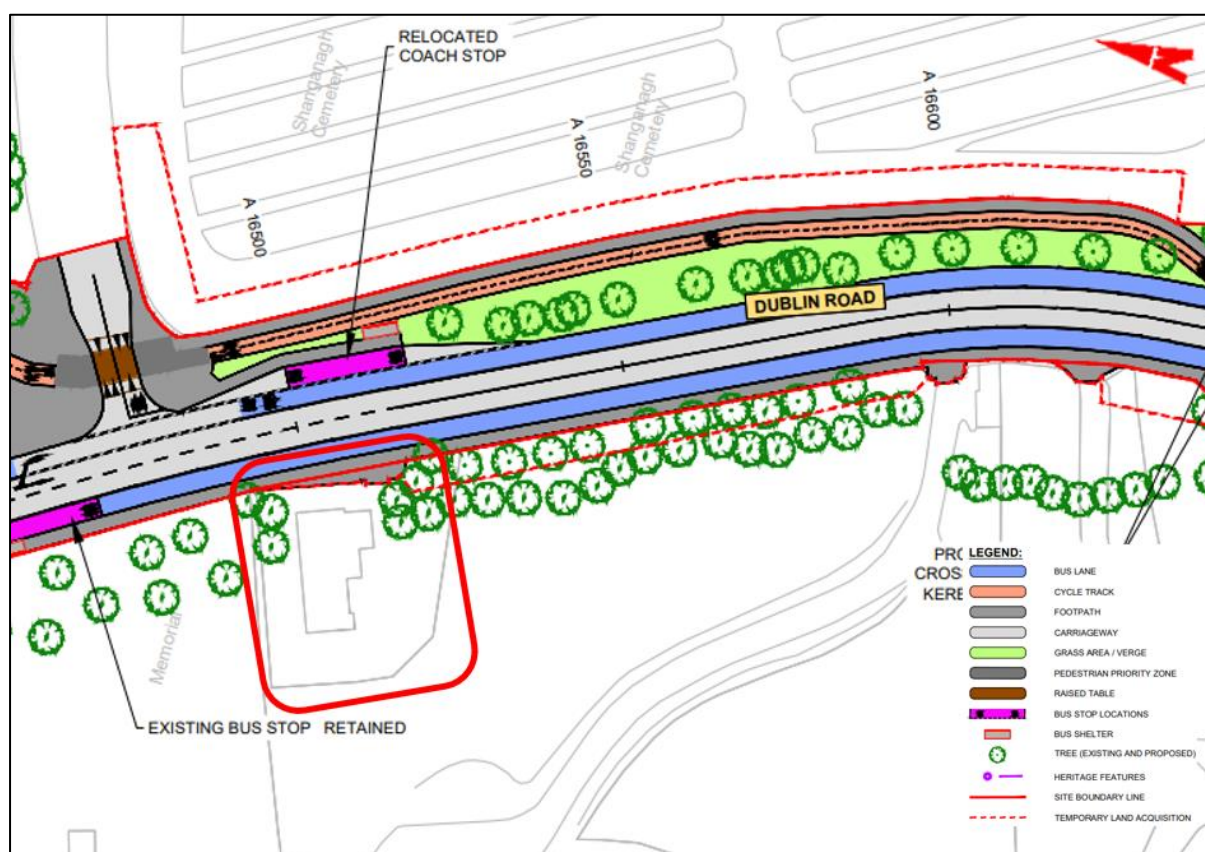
Extract from General Arrangement Drawing at Shanganagh Marble and Stone Centre on Dublin Road (Sheet 47)
